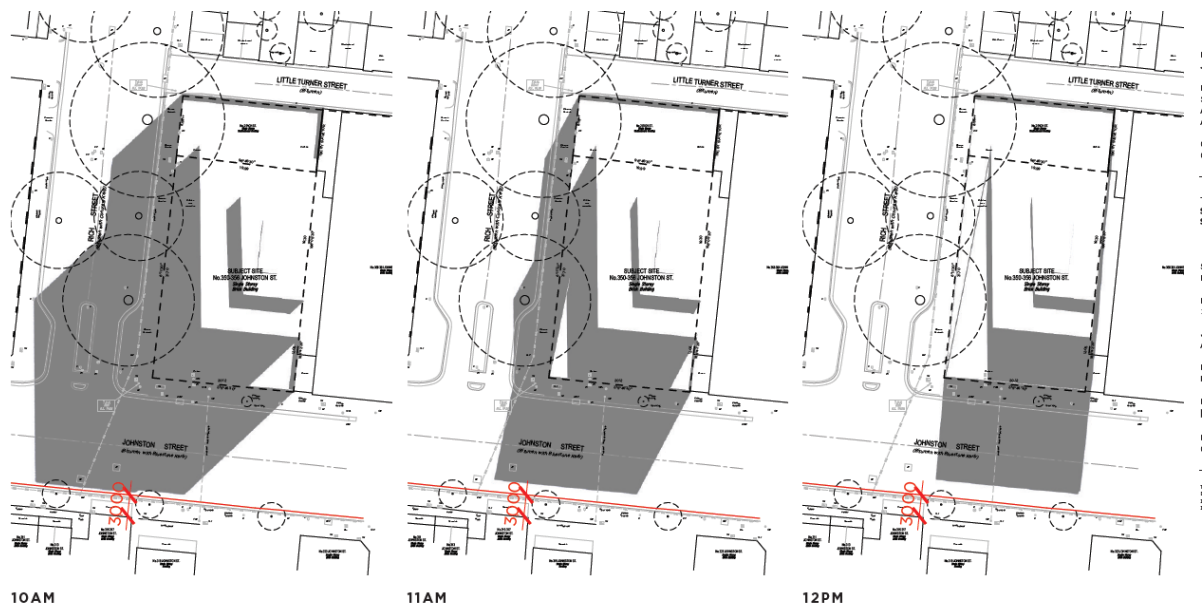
Proposed equinox shadows between 10am and 12pm (Applicant submission, December 2020)
